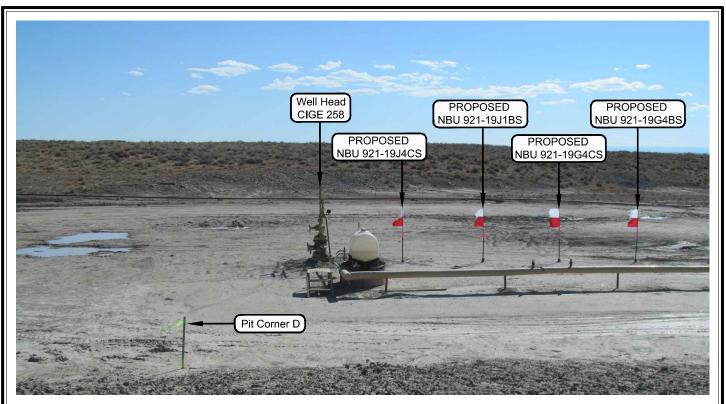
PHOTO VIEW: FROM PIT CORNER D TO LOCATION STAKE
